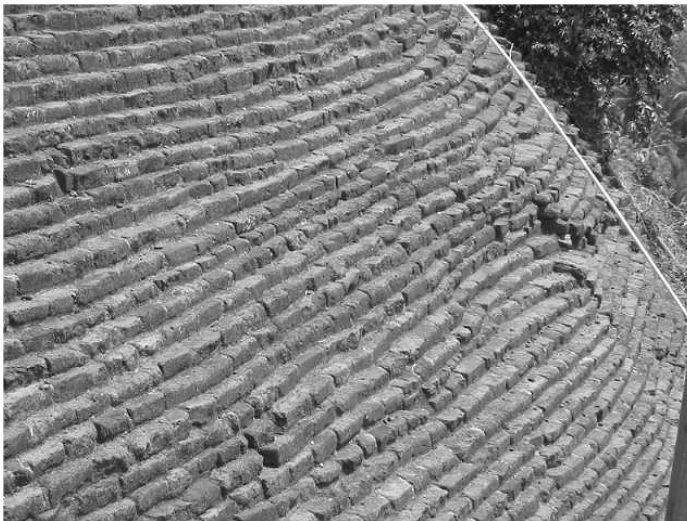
Jetavana stupa dome restoration showing pointed brickwork
